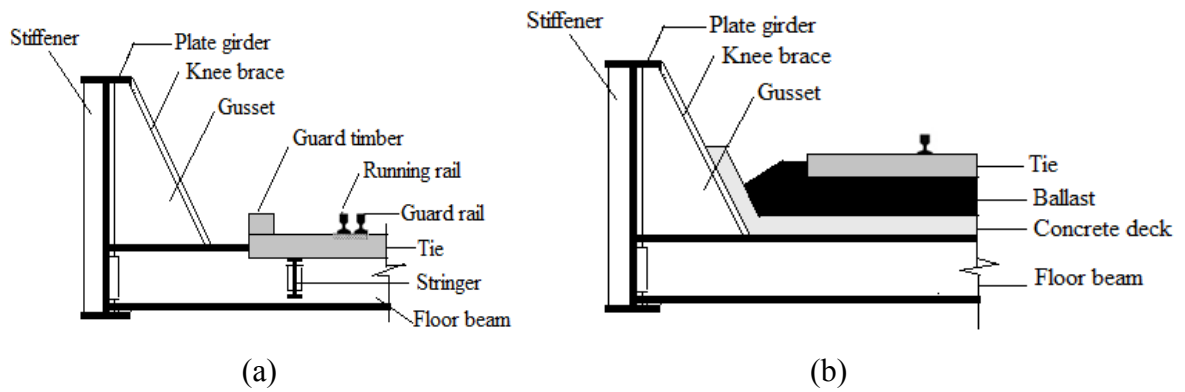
(a) Open-deck through-plate girder (b) Ballasted-deck through-plate girder [12]
